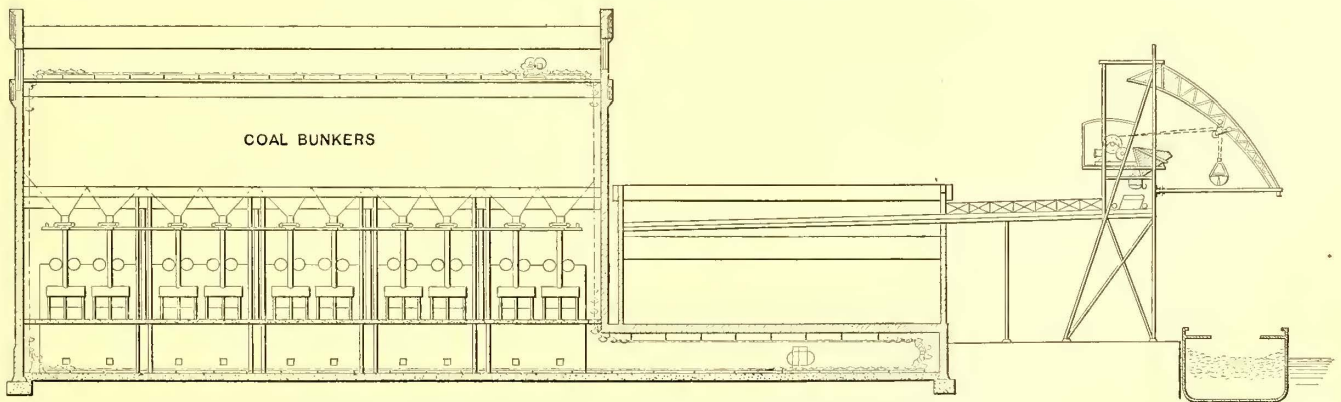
SECTION OF BOILER ROOM SHOWING COAL CONVEYOR
